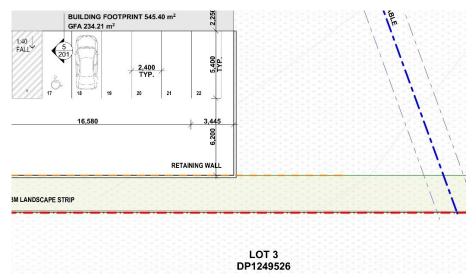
B: DA approved driveway adjacent to SES building (source: F&J Tepa)
